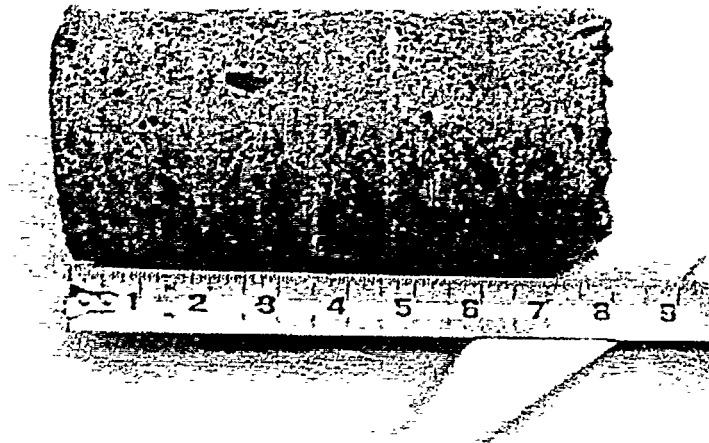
Concrete core from engine pad (location 74.SB010).
